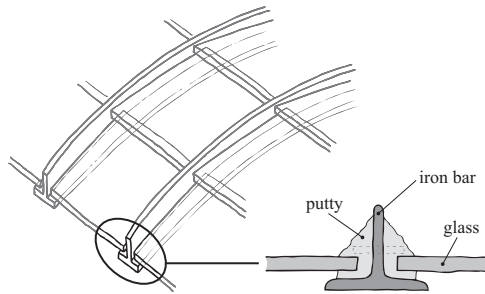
Section of a typical 19th-century construction detail: the single glass plate is connected to the iron section with putty.
